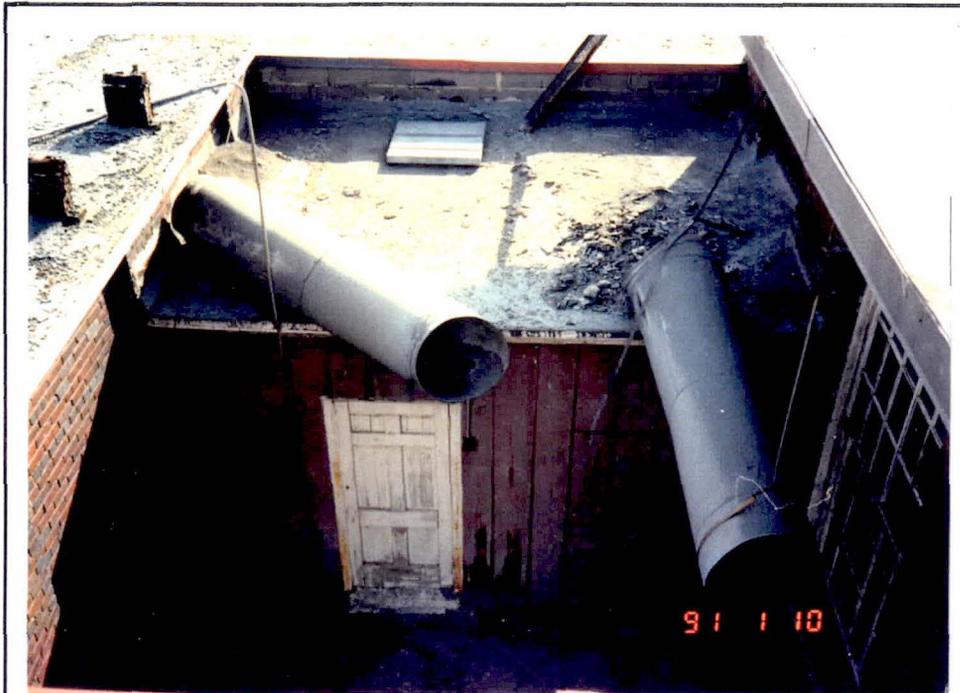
View of the buffer dust located on the roof of the manufacturing building.
